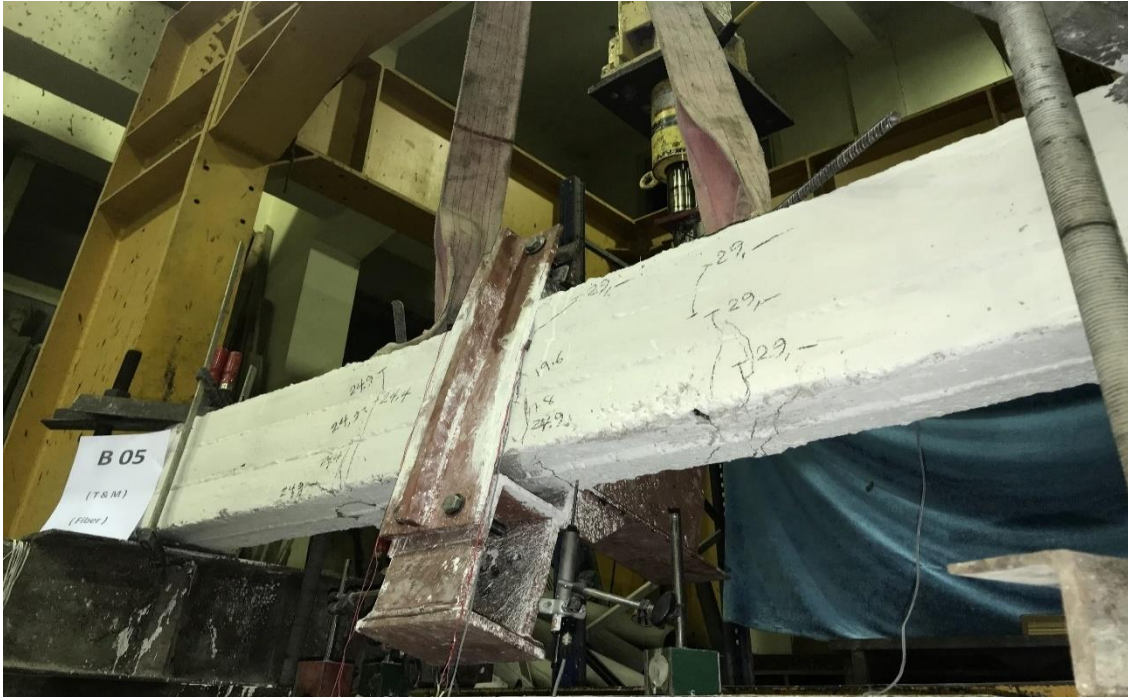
c): Cracks Pattern for the Bottom of Specimen B5.
